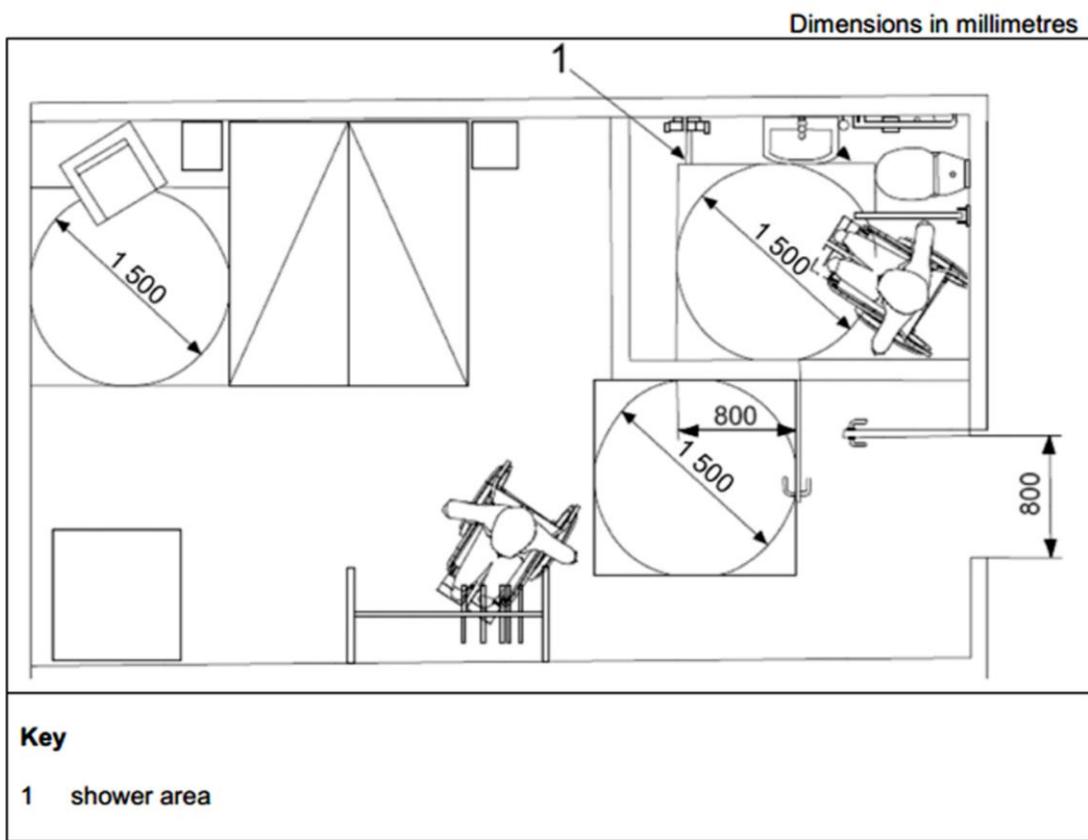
Example of space allowances for accessible bedroom dan bathroom
